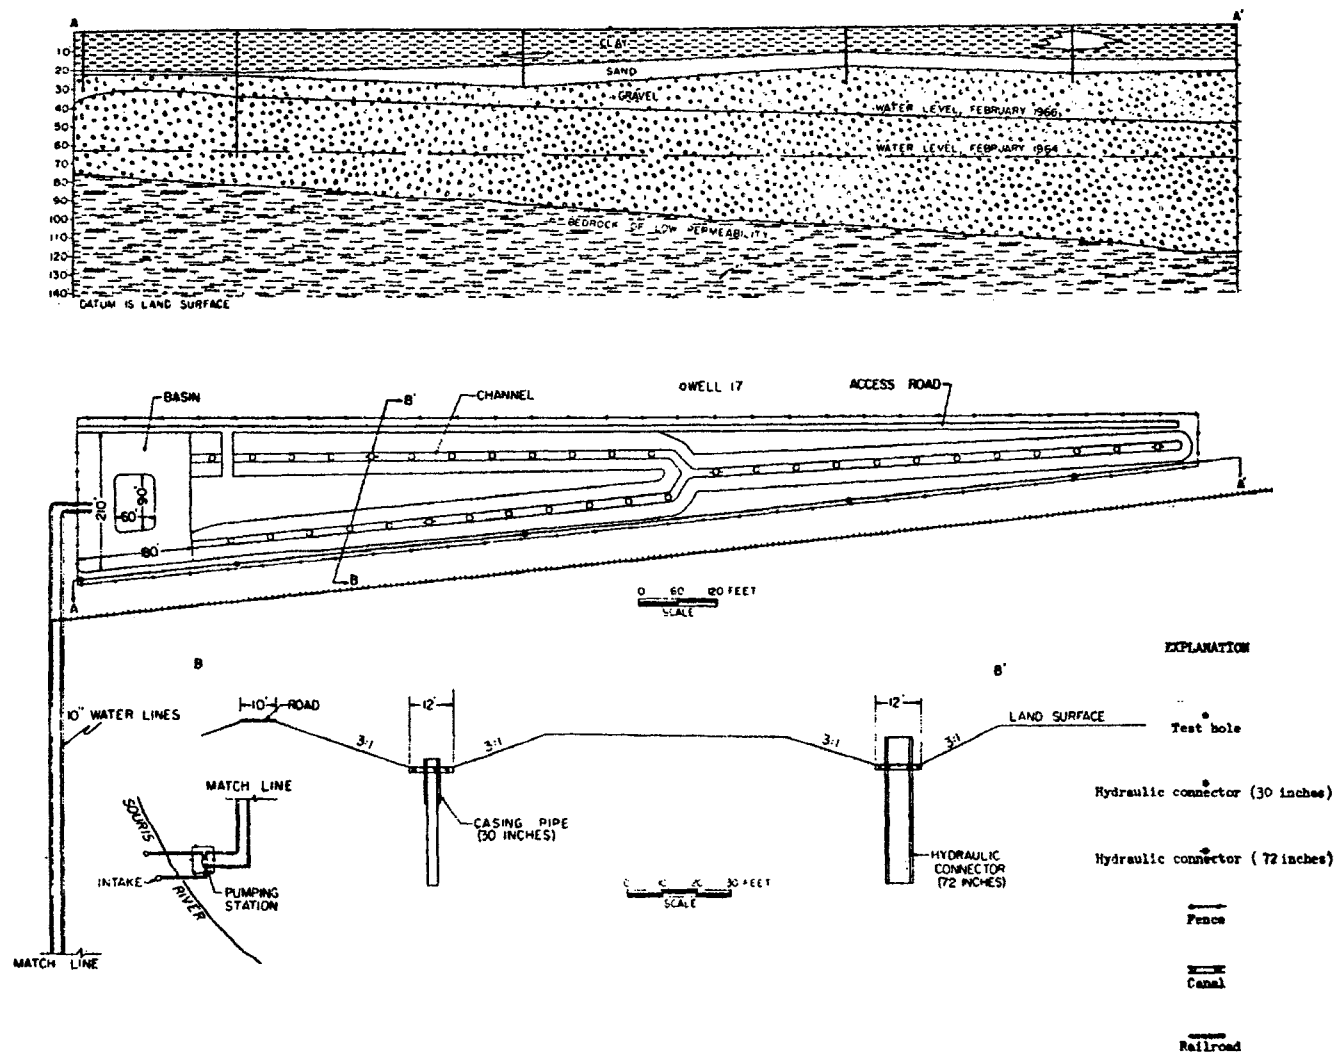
Geologic section, plan view, and cross section of Minot's dual artificial-recharge site.
